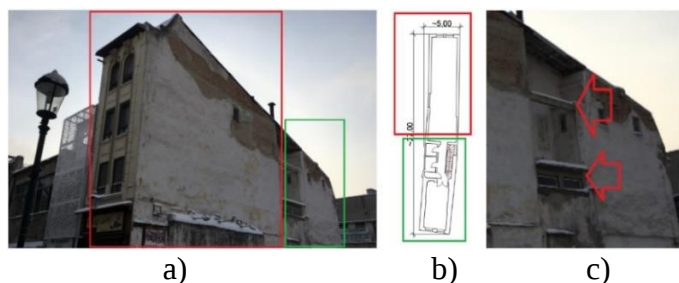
a), b) Identification of building sections; c) Exterior elements of continuity outside the building - reinforced concrete beams [119]
